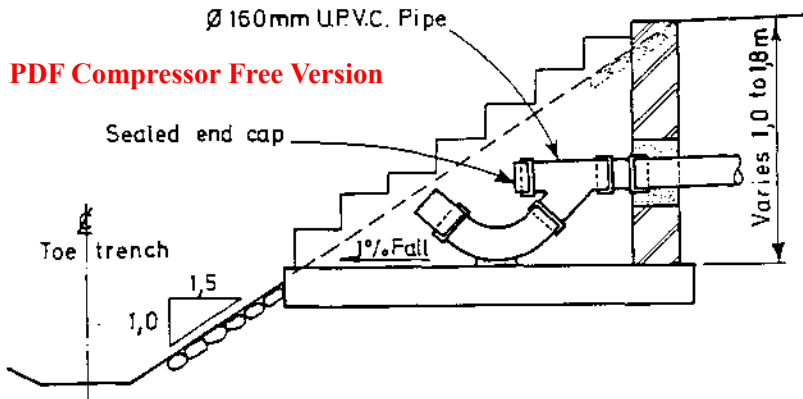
Outlet detail for drain to prevent clogging by oxidation (Lyell & Prakke 1988).
